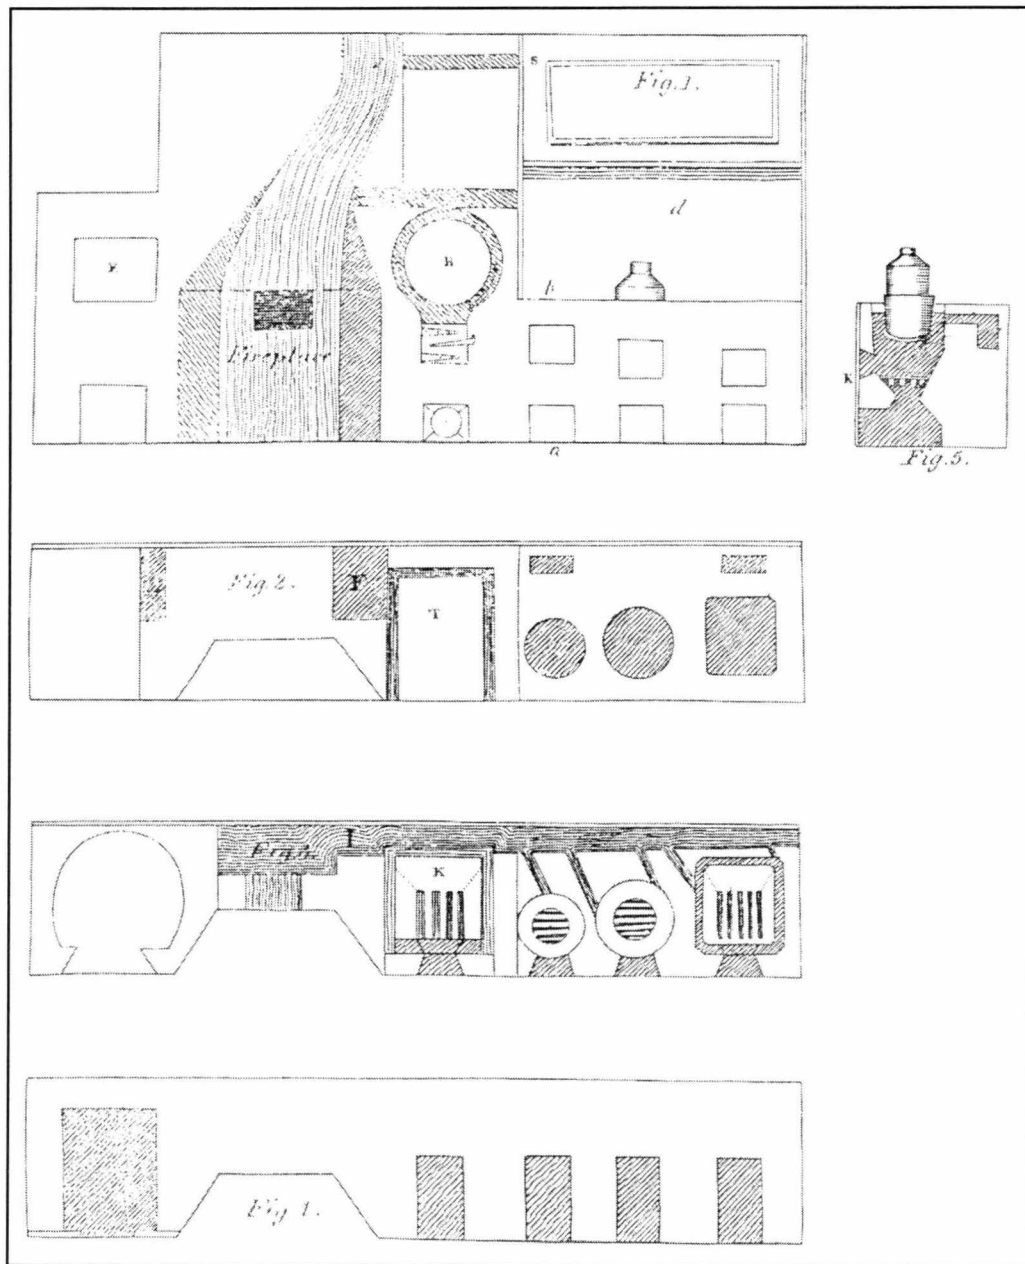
Fireplace wall with Rumford roaster and stew stove (“American Builder’s Companion” by Asher Benjamin, 1827).
